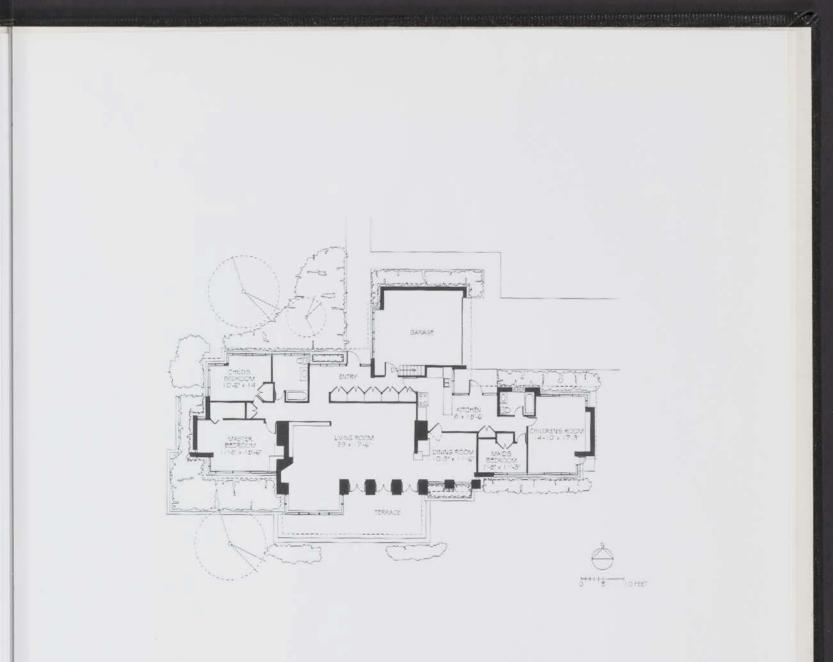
Edouard Mutrux and William Adair Bernoudy, Talbot House, plan.
